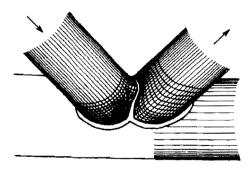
Failure Mode of K – Joint with Instable Brace Walls
